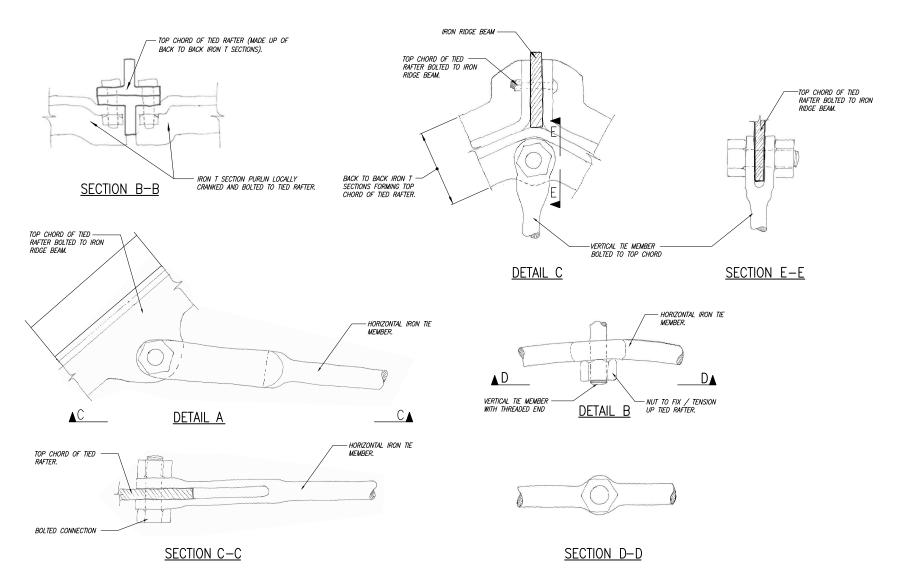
Sketch drawing from observation of existing 1879 canopies on platforms 2–4 showing roof details
